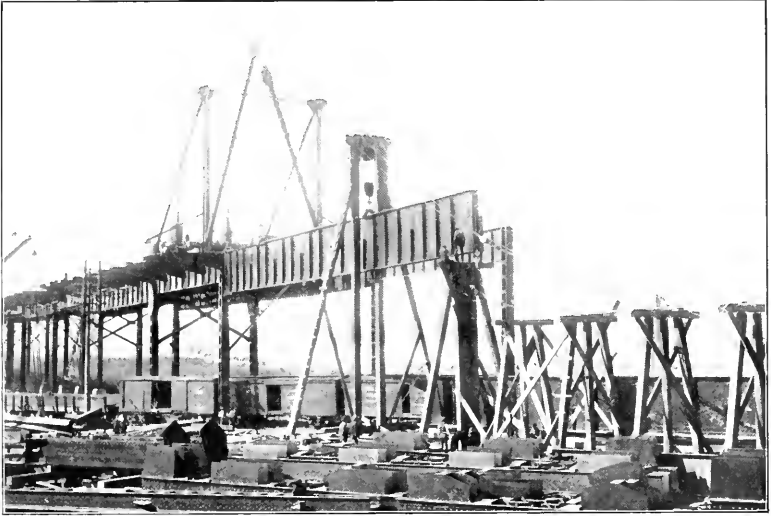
GALLOW'S FRAME USED IN THE ERECTION OF LONG GIRDERS.
